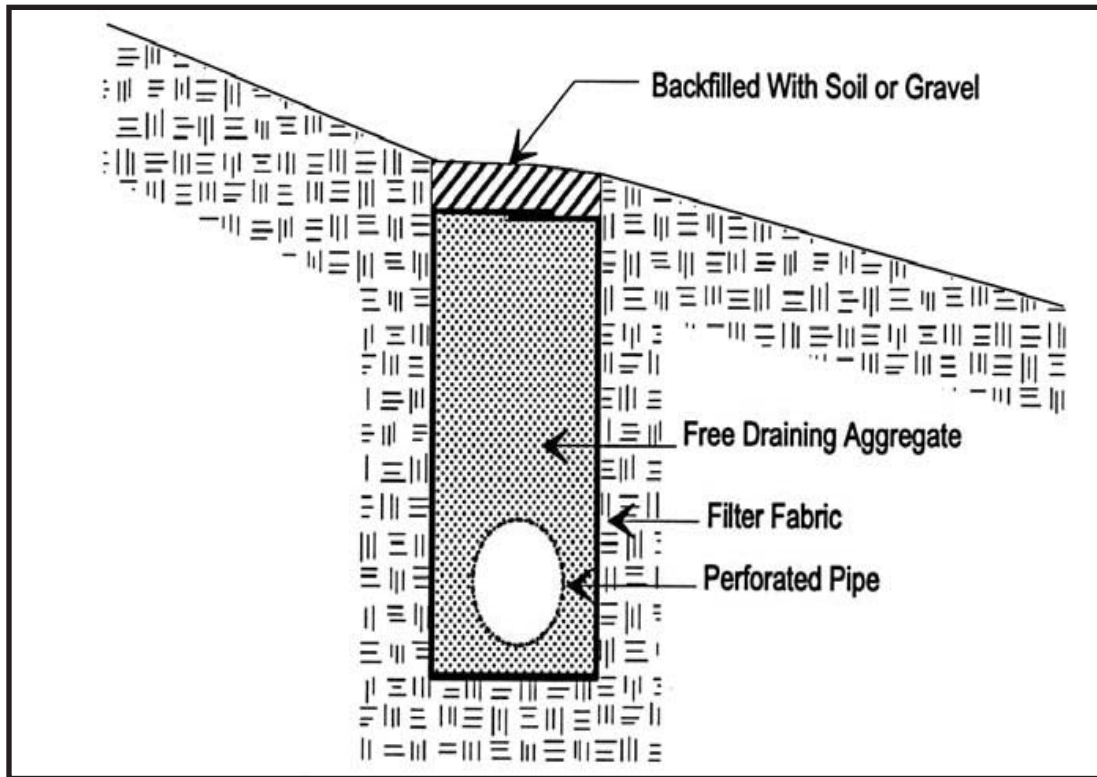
Typical Detail for Installation of Subsurface Drain
